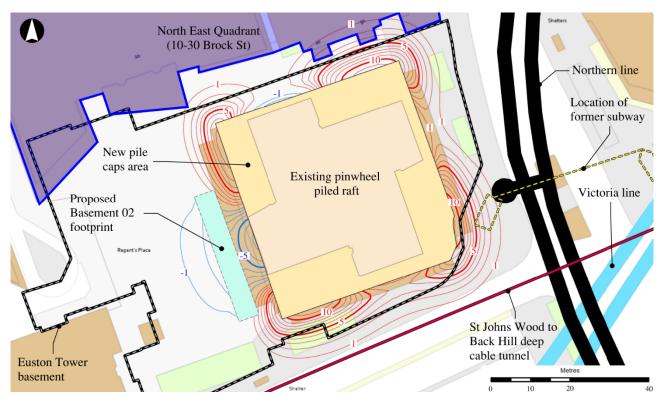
Calculated short term ground movement (mm) at basement level +21.6mOD resulting from partial superstructure deconstruction, proposed Basement 02 excavation, B1 slab lowering and new superstructure loading (downward movements are presented as +ve).
